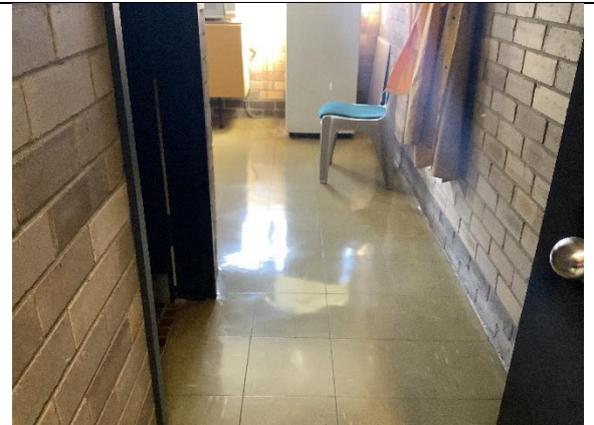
Building E – E.G.7 – Throughout – Floor Covering – Vinyl Tiles – Green
